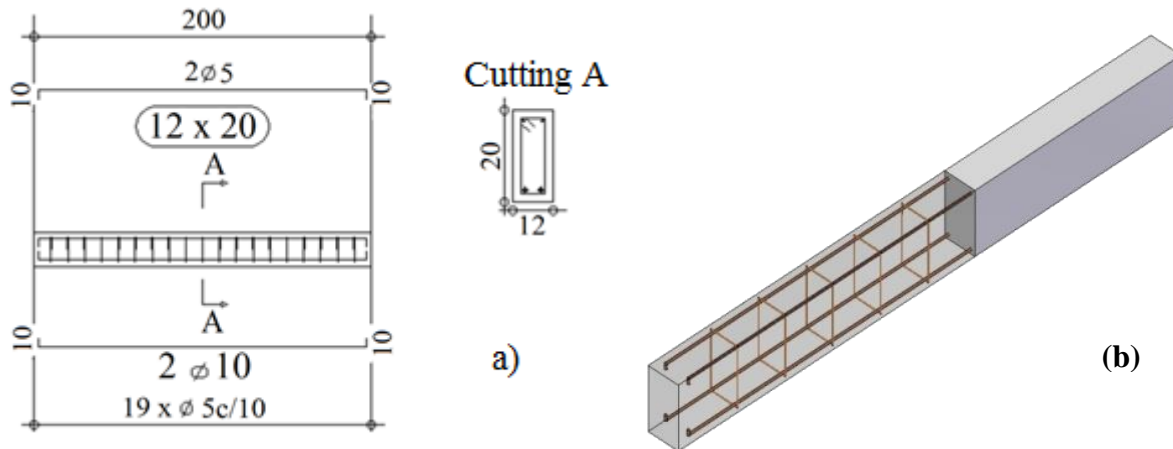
Details of the reinforcement on the beams – (a) Longitudinal detail; (b) Perspective of the reinforcement.
